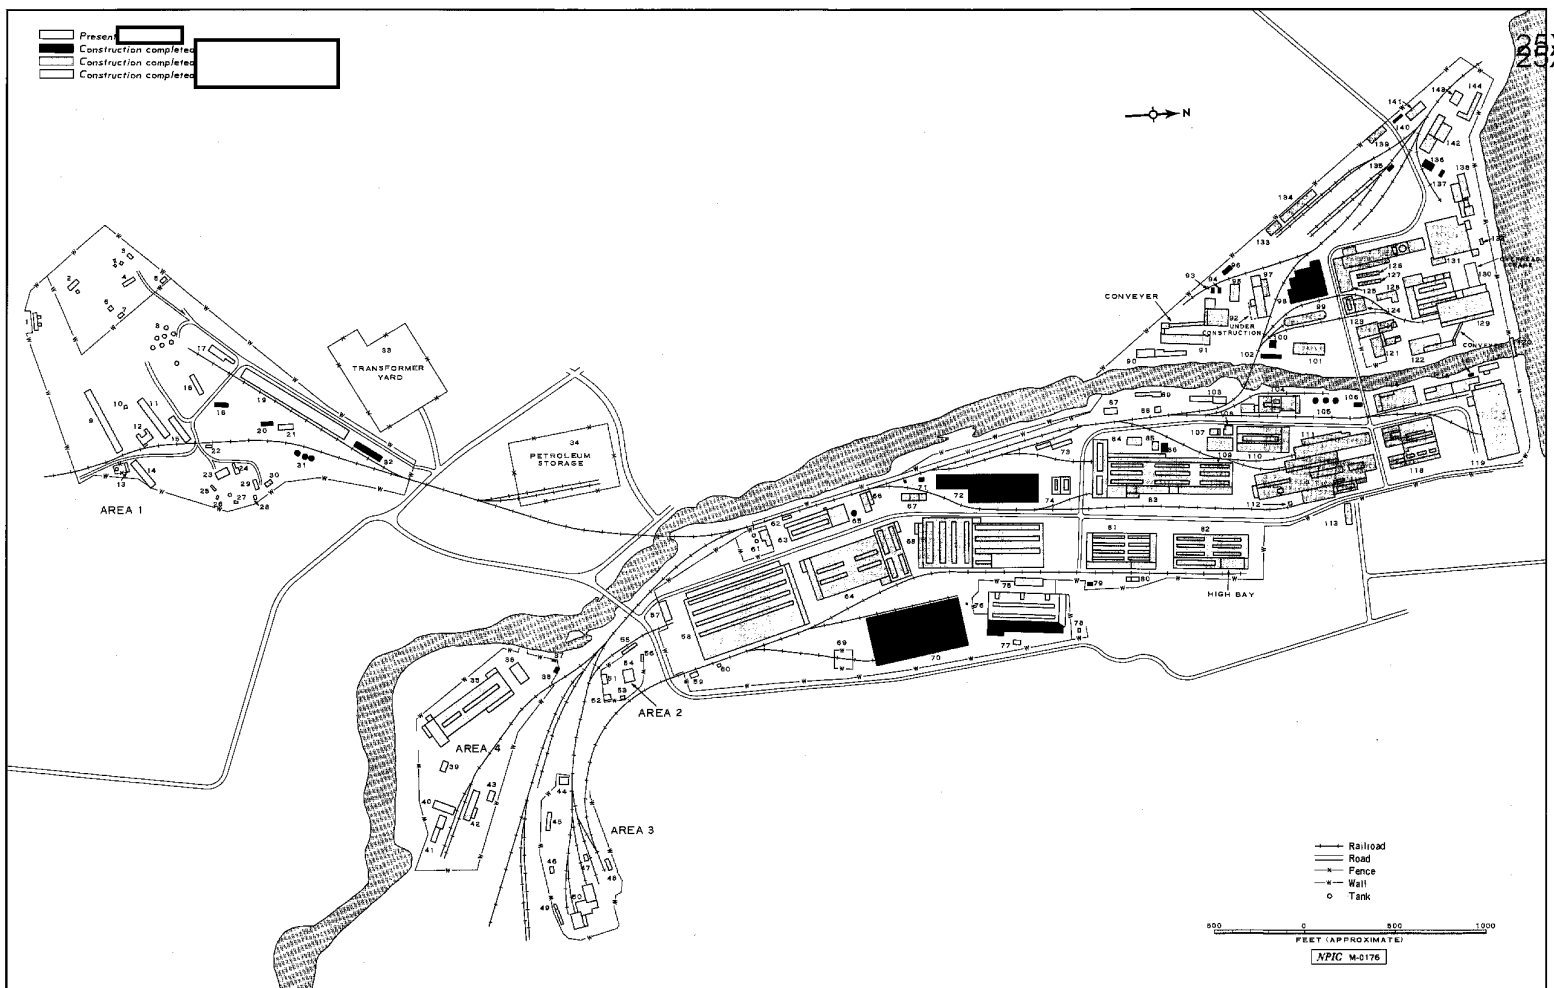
LAYOUT OF ARMS MACHINE AND STEEL PLANT 235, VOTKINSK, USSR.
